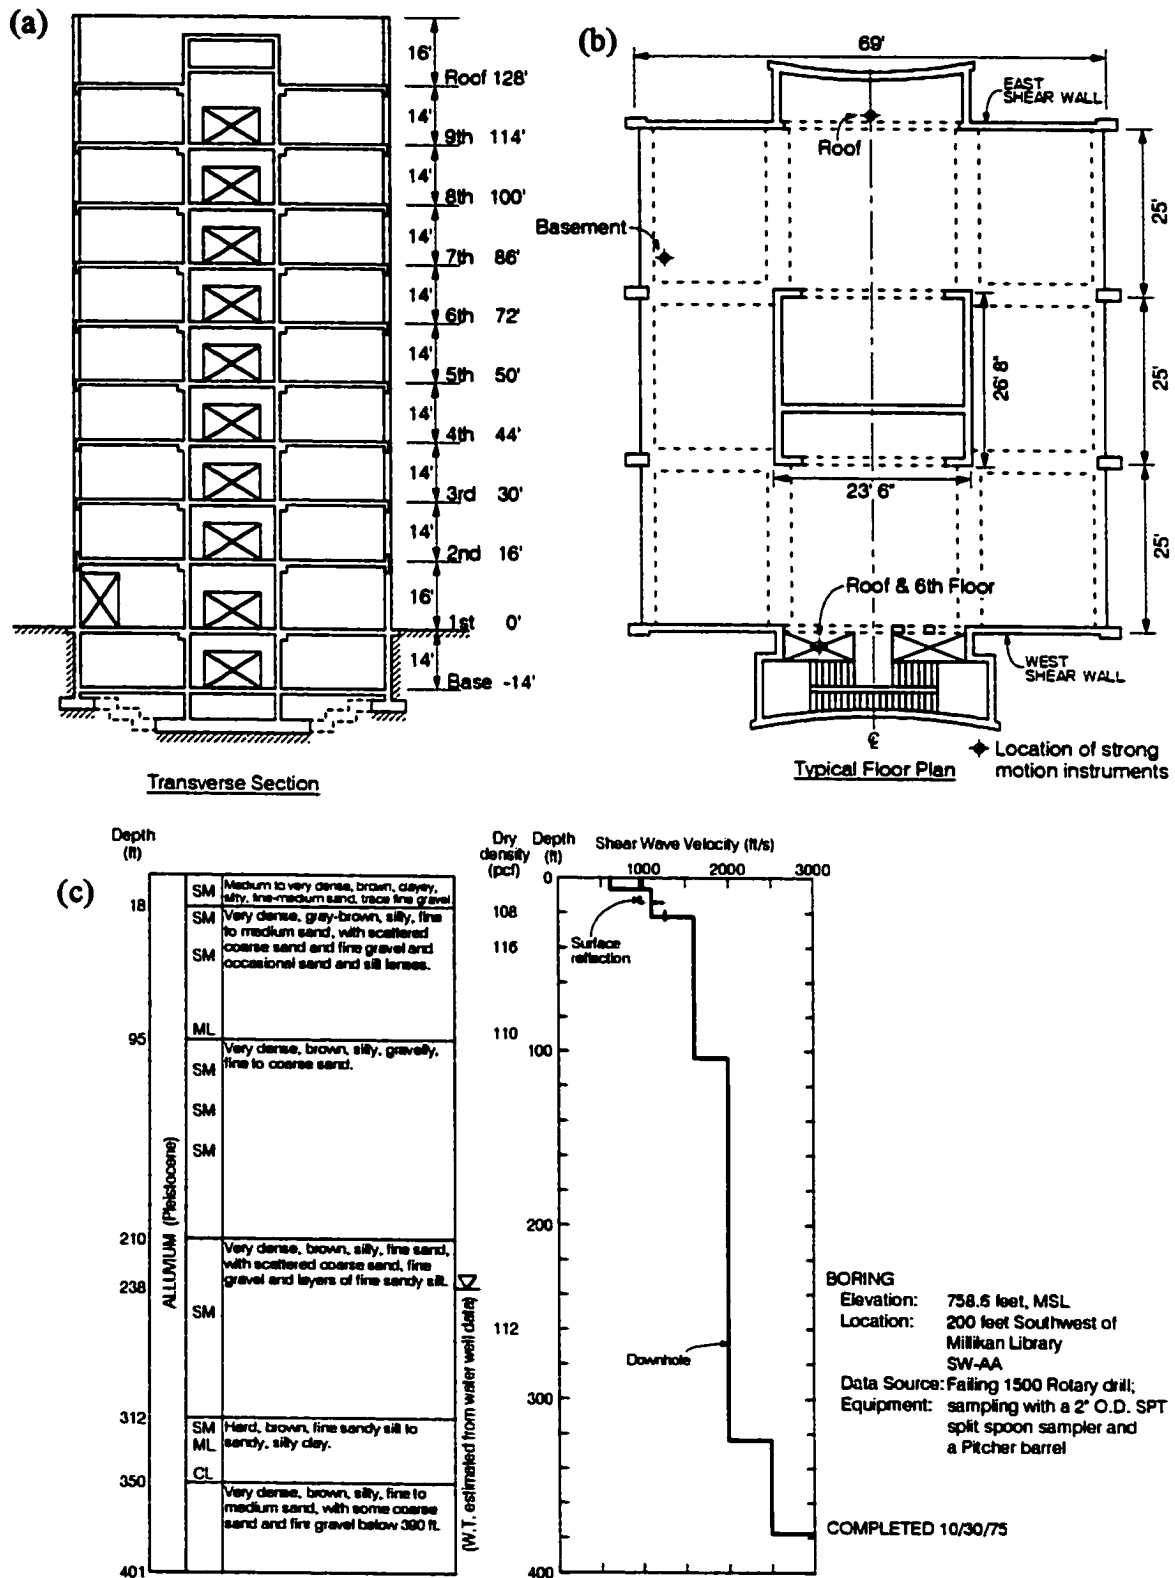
Millikan Library structural system: (a) Transverse section, (b) typical floor plan, and (c) log of typical soil boring.
